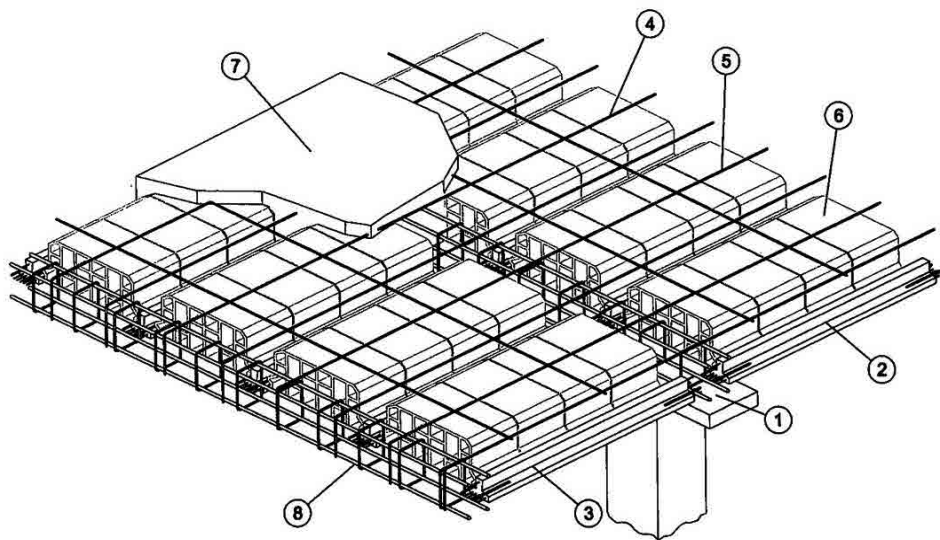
One way spanning slab with cantilever – prestressed half-joists. Design by Susana Mora.
